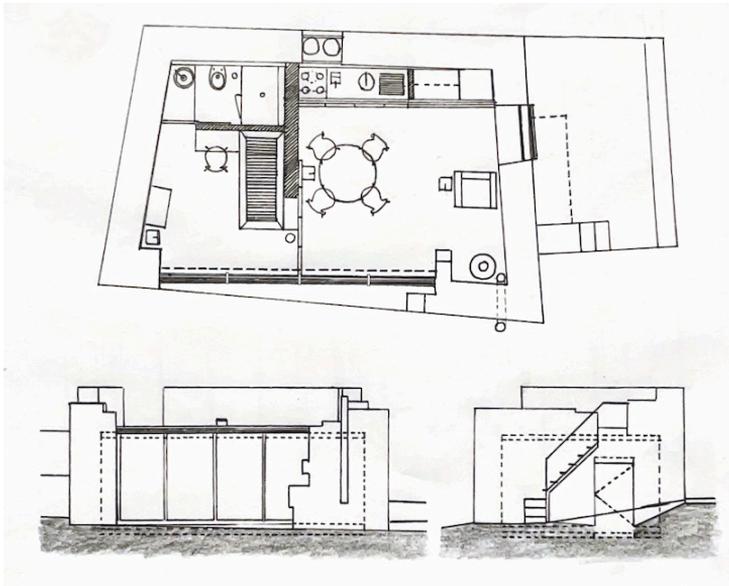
Plans and Elevations of the Project, Redrawn by the author, 2025.
